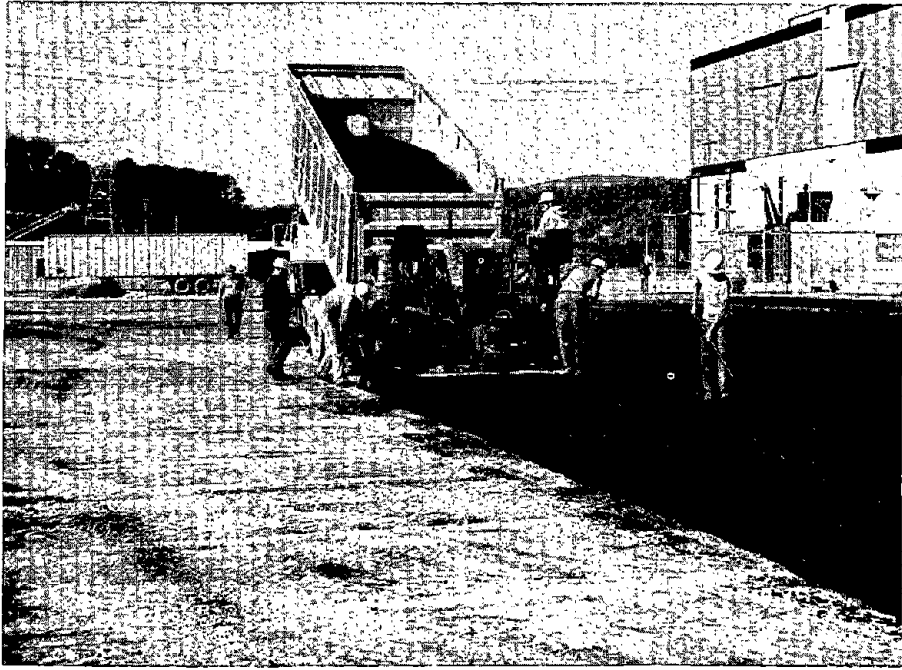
Construction of wearing surface at Harrison Power Station parking lot.
